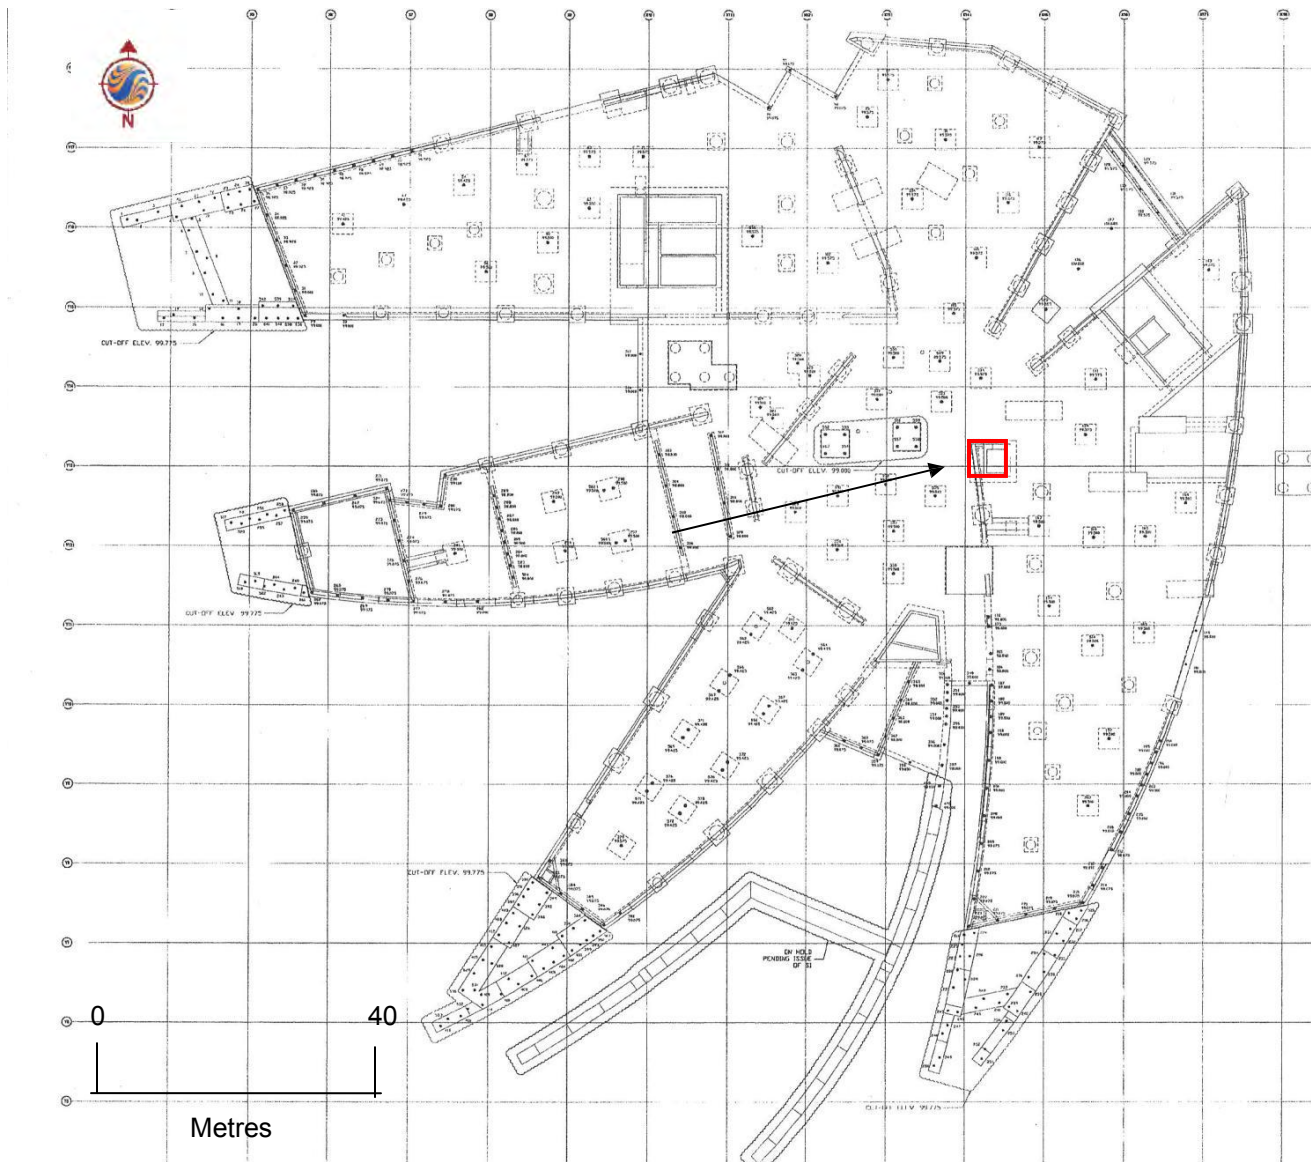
CMHR plan showing location of Elevator 5.
